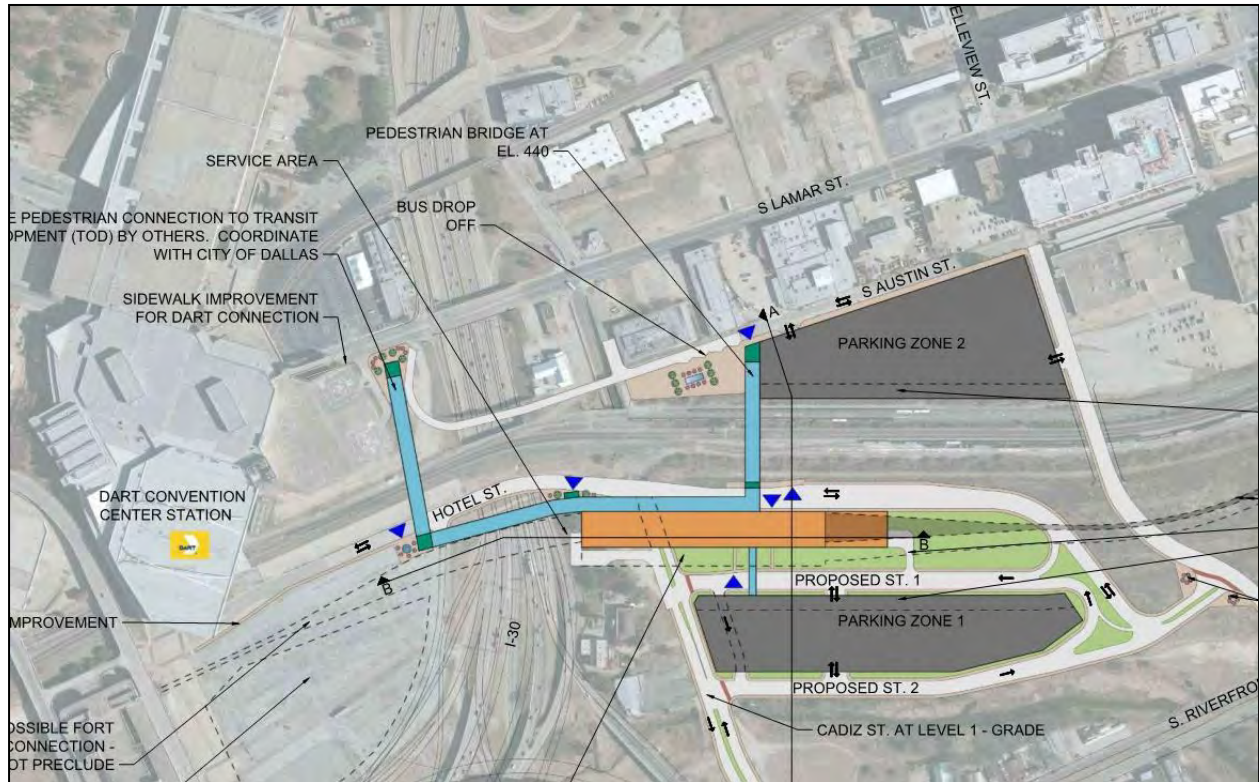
Dallas High-Speed Rail Station Plan View (from HSR DEIS)
